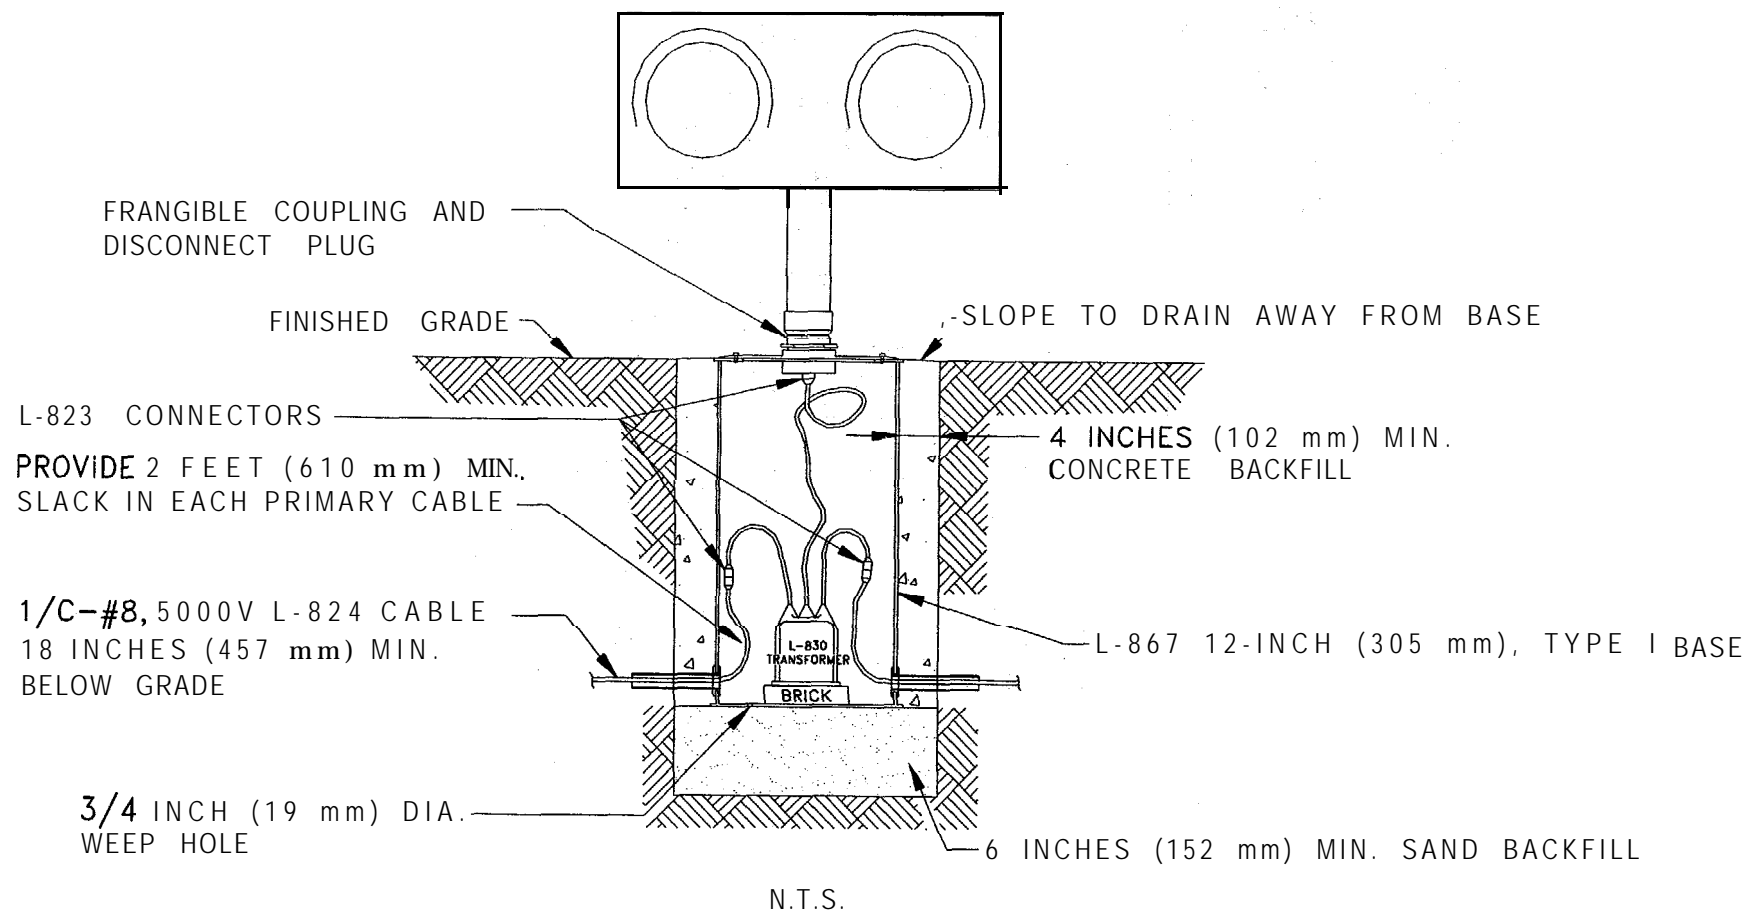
TYPICAL ELEVATED RGL INSTALLATION DETAILS
